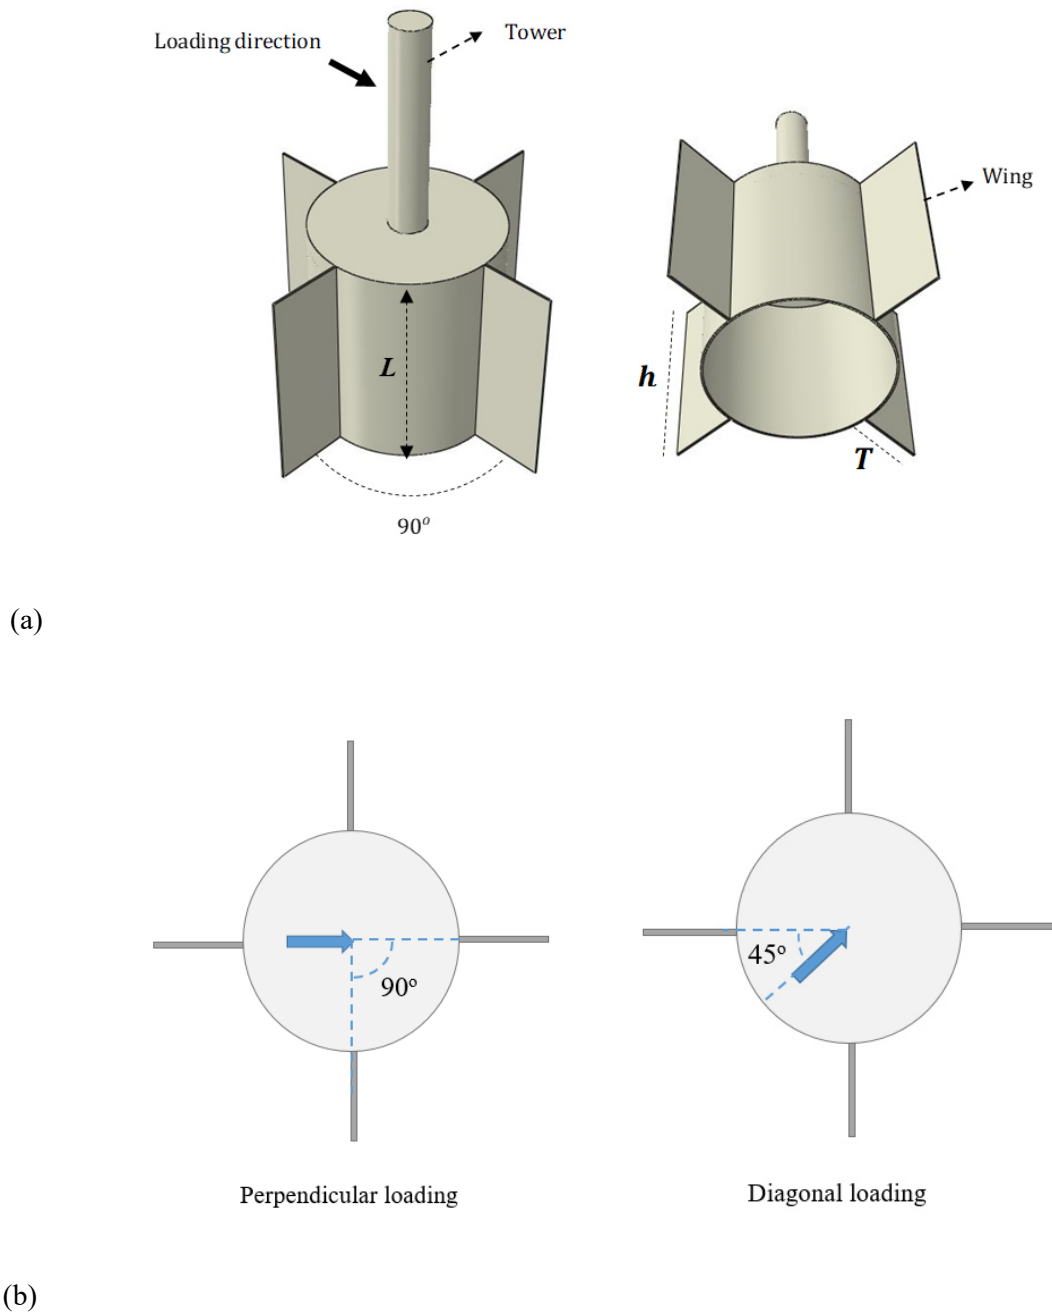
a) A schematic of the proposed winged suction caisson; (T , wing width; h , wing height, L , skirt height); b) Cross-section of the winged caisson
